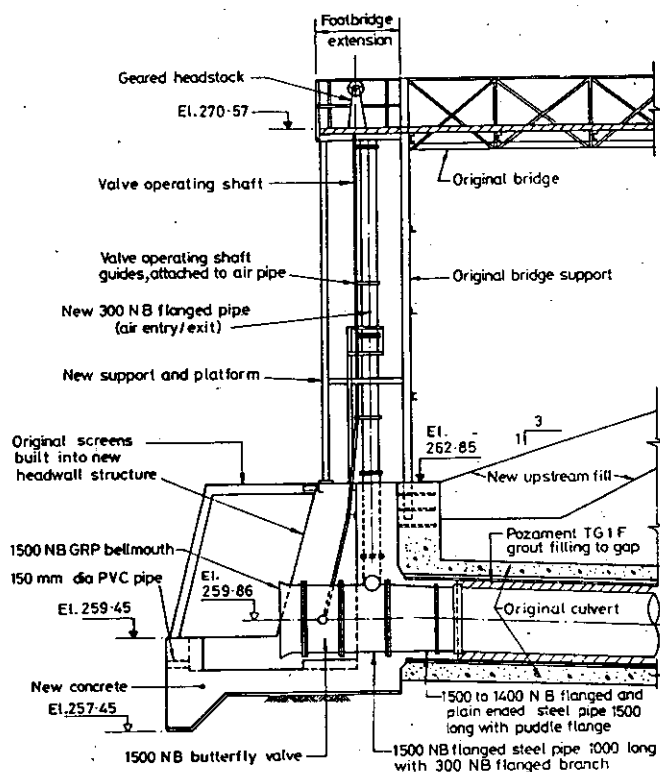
Sectional elevation showing modifications to Coedty draw-off intake
